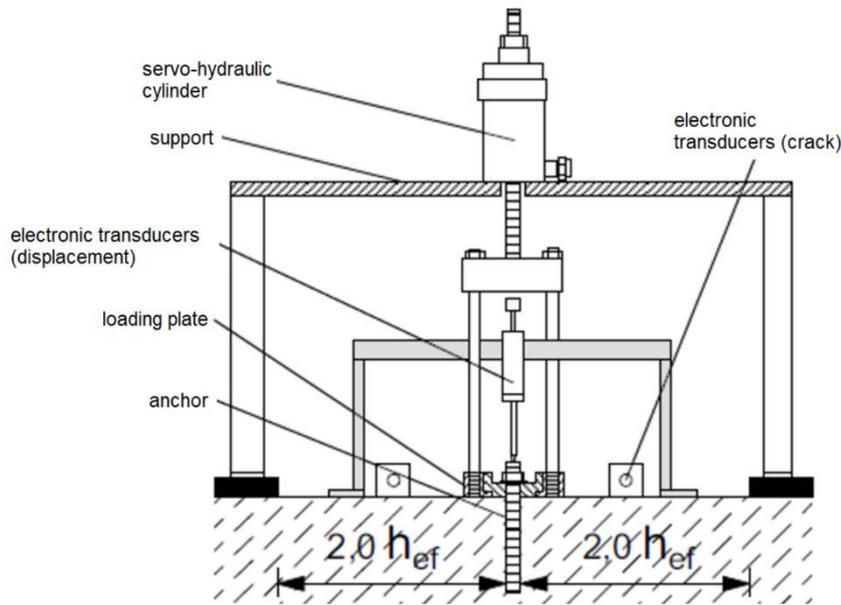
Loading setup for tensile tests away from edges in cracked concrete according to [3]
